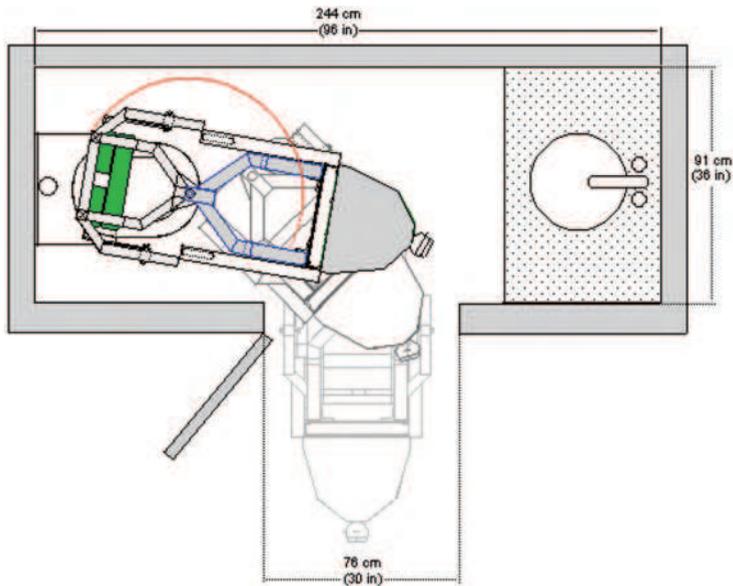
CAD top view drawing of the HLPR Chair accessing a typical bathroom and toilet. The radius drawn is the area needed for the seat frame to rotate.
